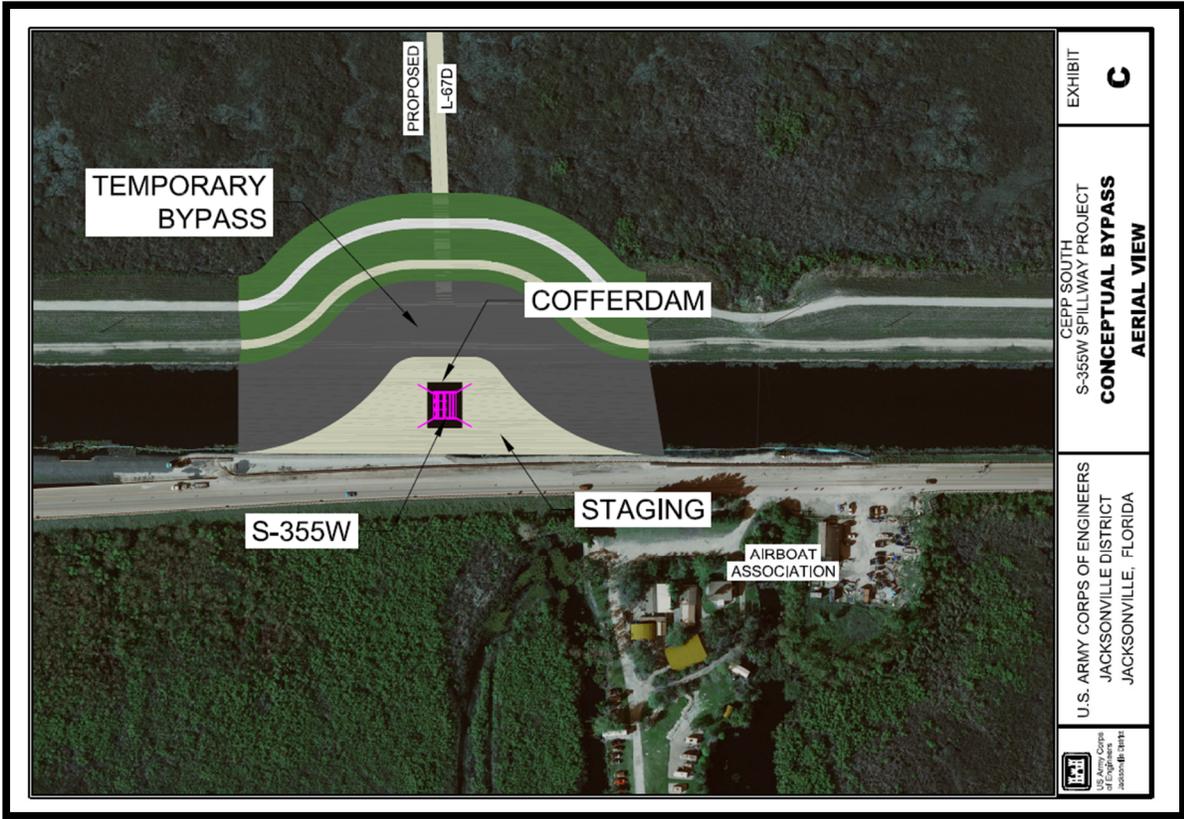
PRELIMINARY DESIGN AND LOCATION OF PROPOSED S-355W SPILLWAY TO INCLUDE POTENTIAL BYPASS CANAL AND STAGING LOCATION.
